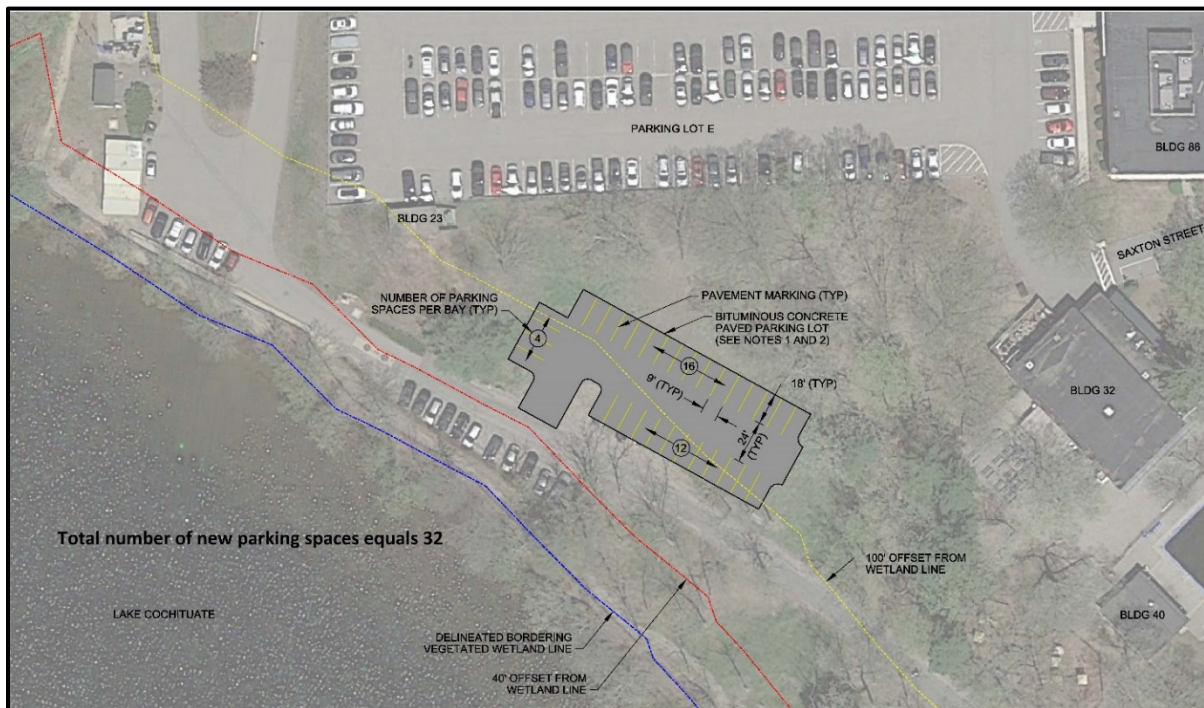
Parking Lot Construction South of the S2PRINT Building
